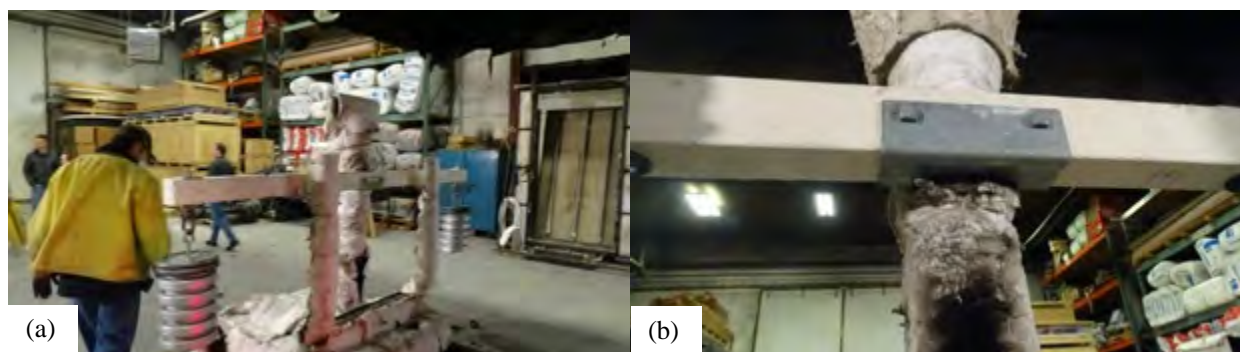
Representative crossarm samples before testing showing (a) Test 3, and (b) Test 6 fixture.
